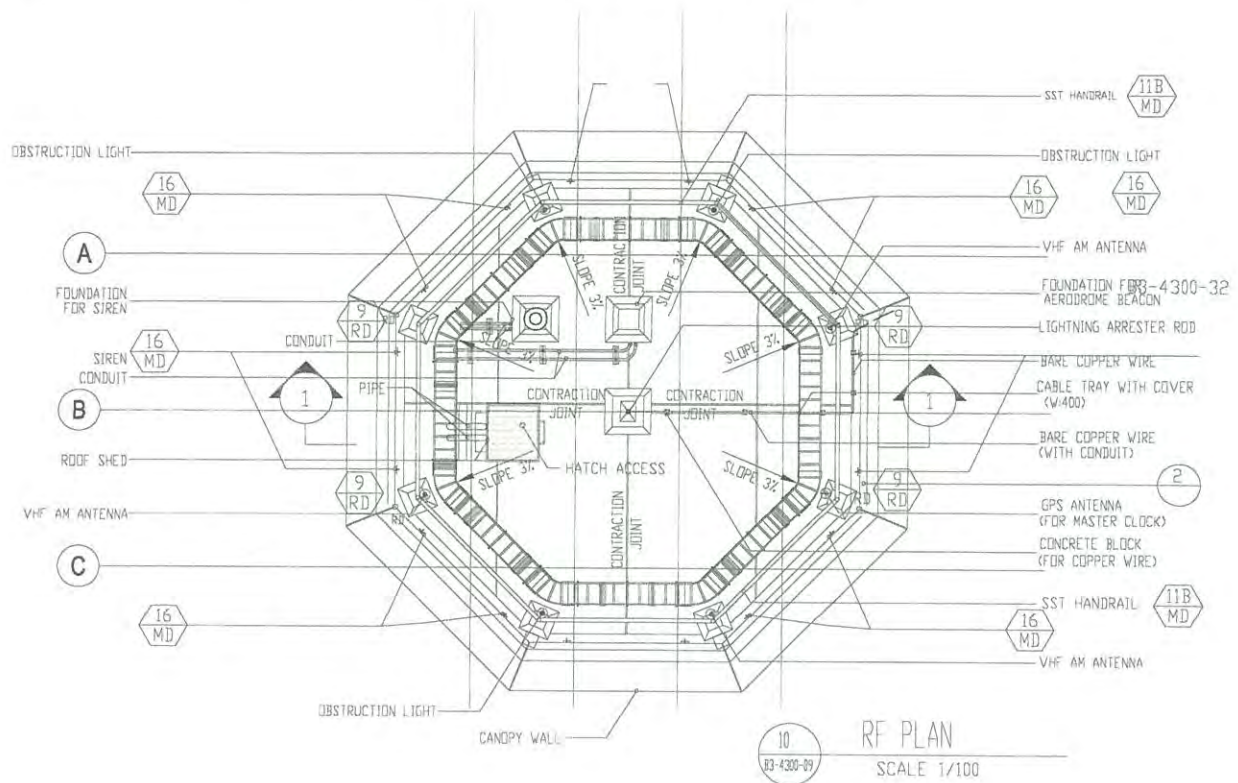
Draft layout plan of the ATC tower office building
